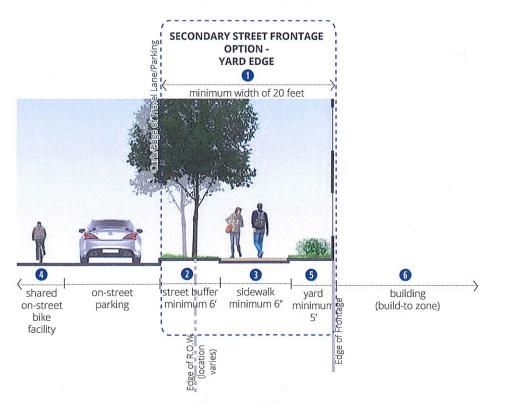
Secondary Street Frontage Option - Yard Edge
